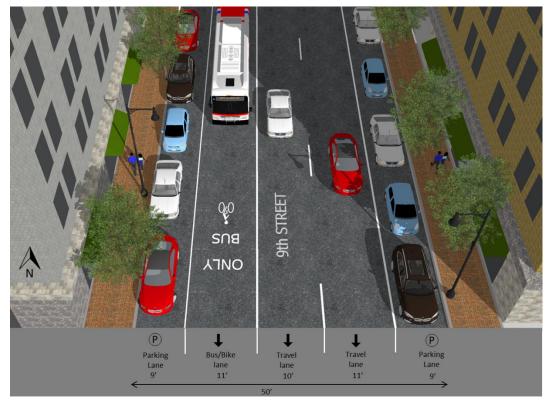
Alternative 0, 9th Street South of Massachusetts Ave
